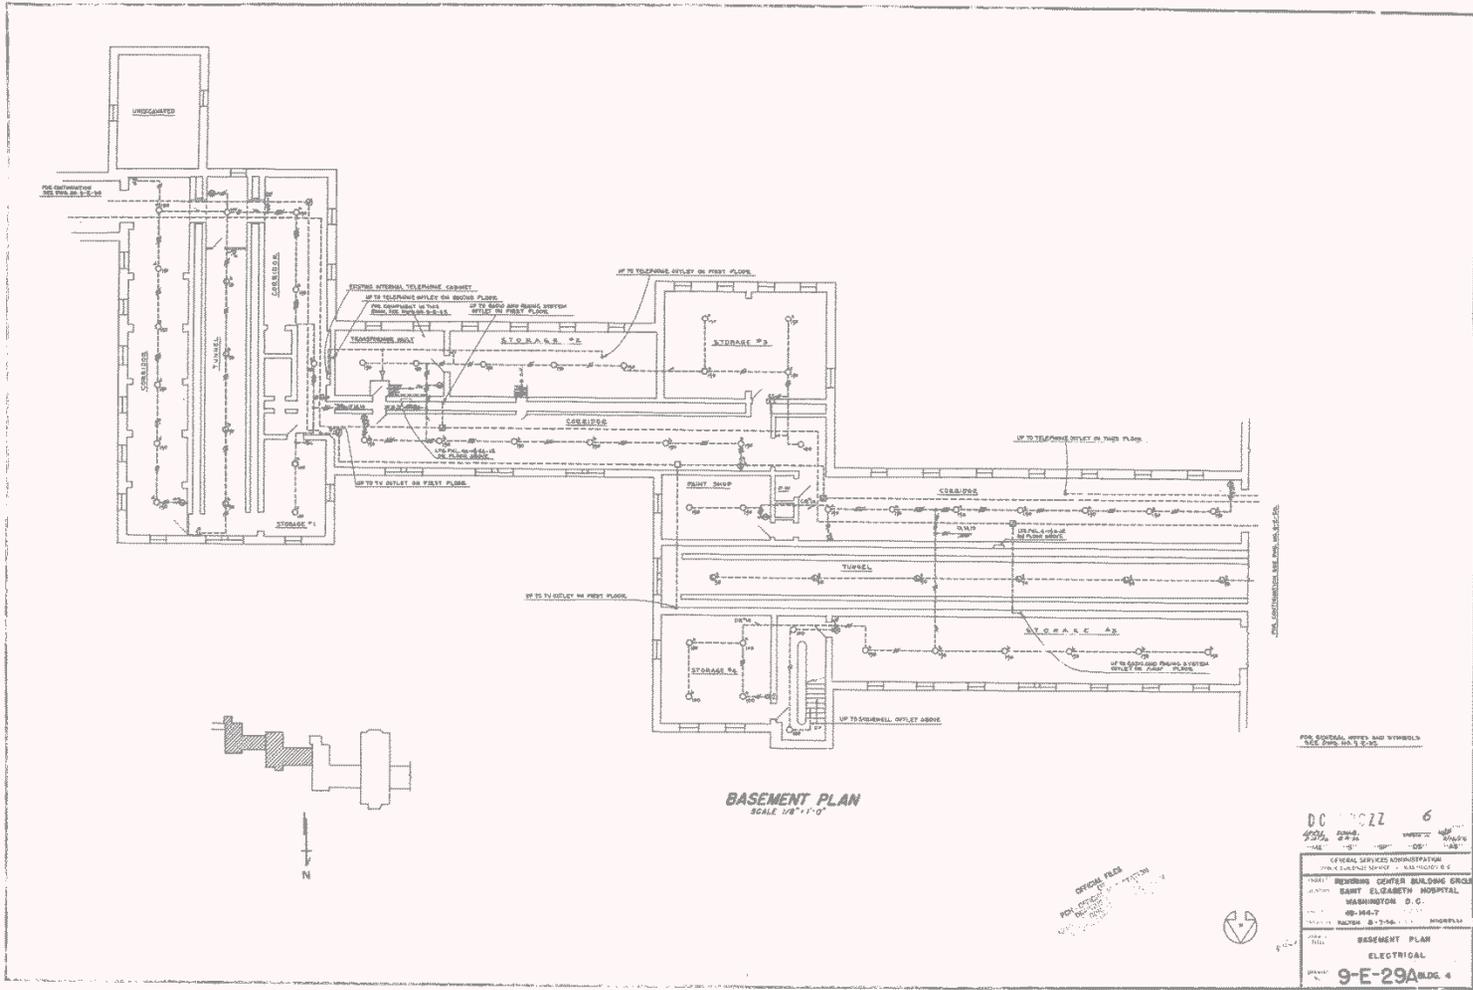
Basement plan of the East Wing outlining electrical system improvements, 1956. Source: GSA archives, image DC0080SE0006.
